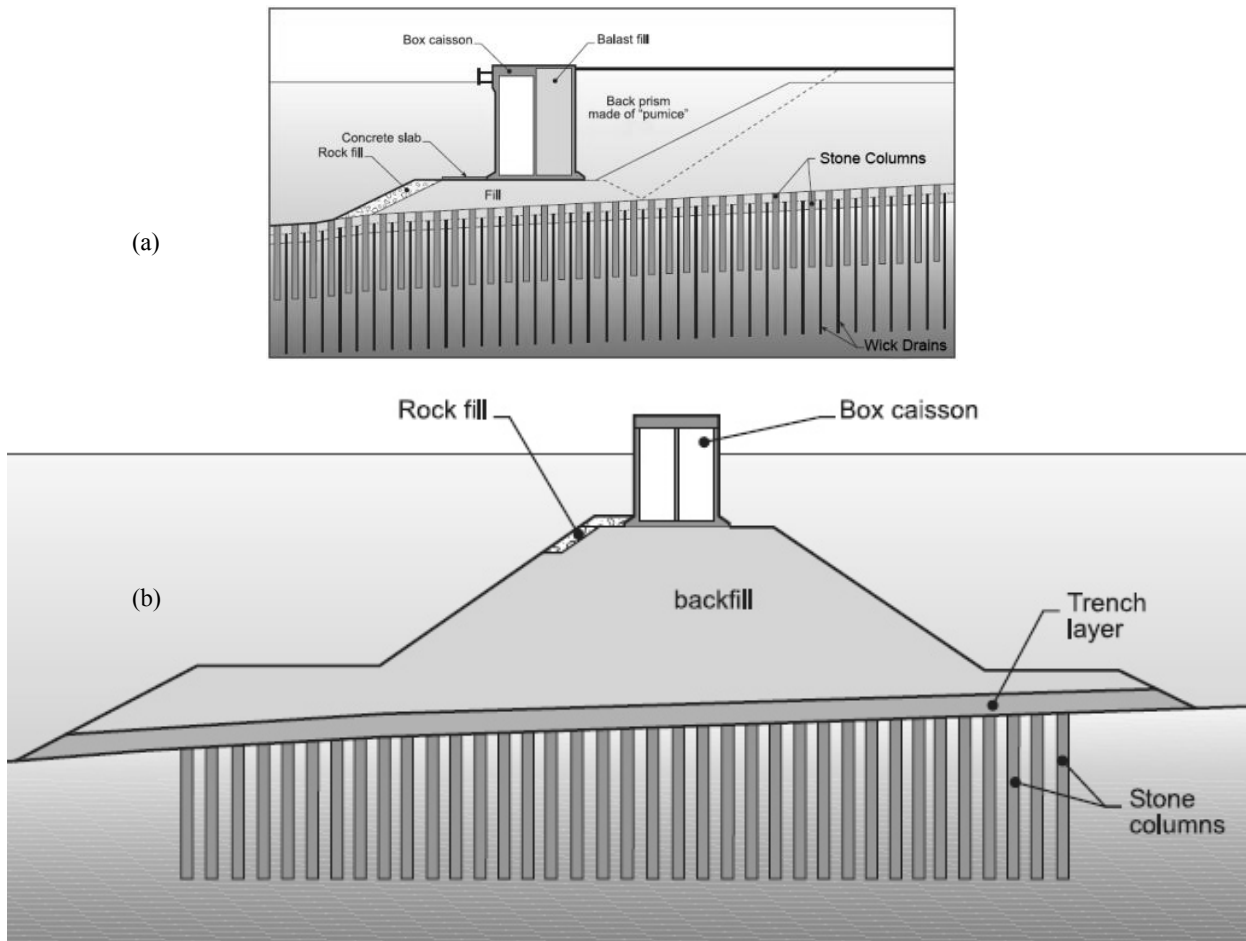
Typical cross sections of (a) the quay wall and (b) the breakwater.
